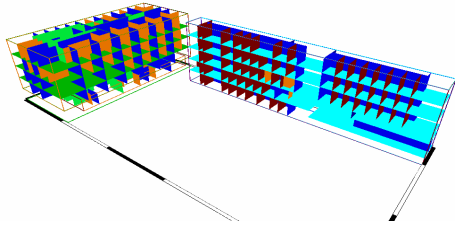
Three dimensional view of modern multi-floor office building in Lisbon
